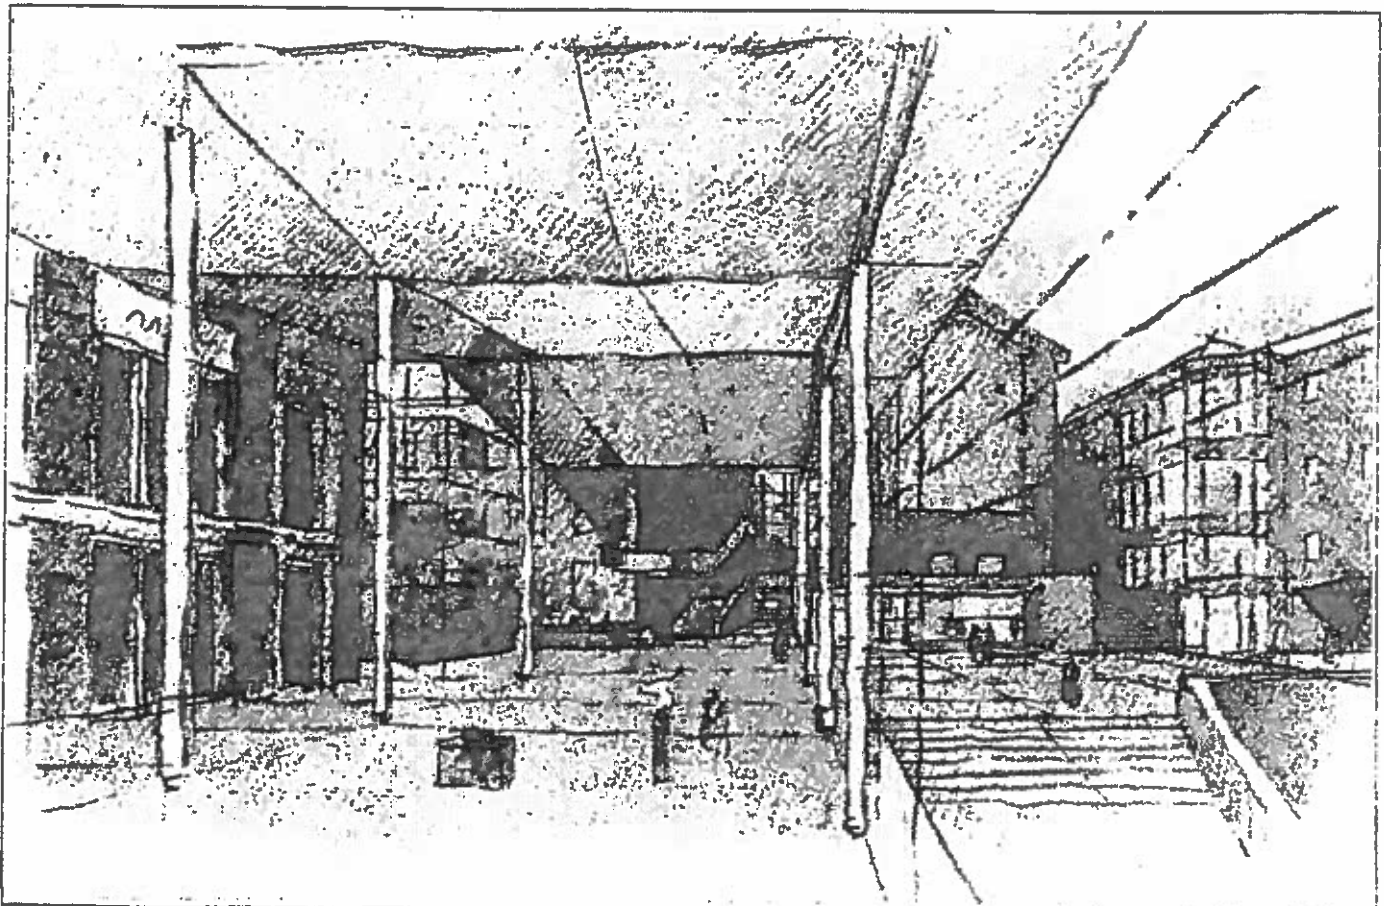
Concept sketch of "Great Hall" with Metcalf and Museum of Art (left); Memorial Hall, Bank Building, and Metcalf Plaza (right)
